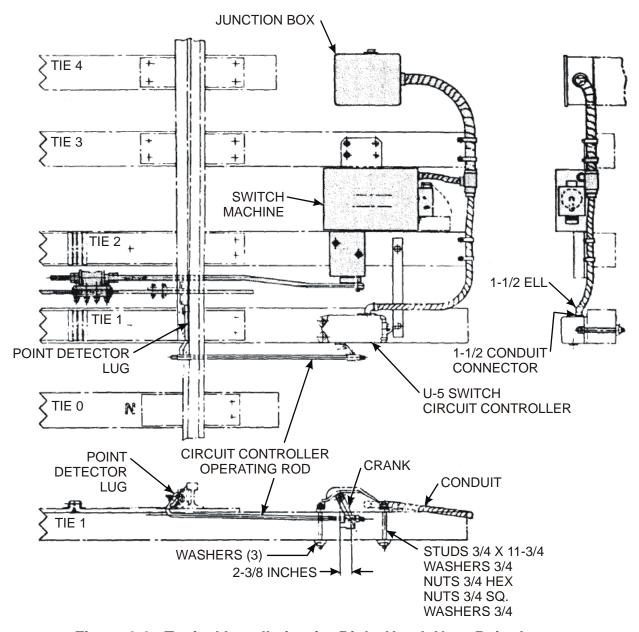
Typical Installation for Right-Hand, Near-Point Layout
